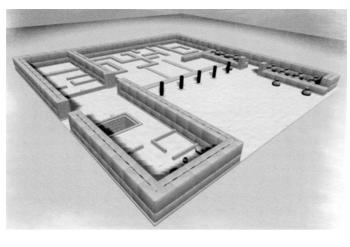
, b: Plan and isometric reconstruction of Alassa Paleotaverna Building II.
